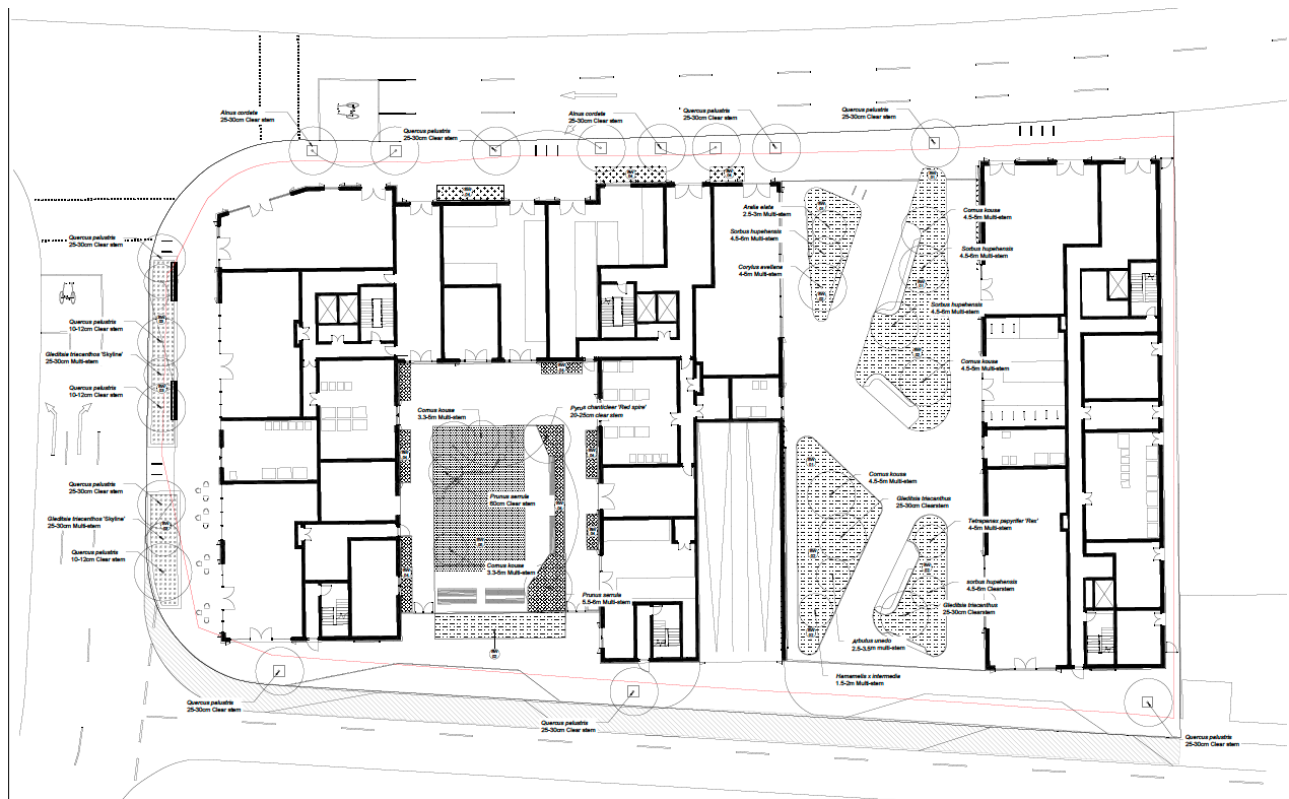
The softworks planting plan - v.2 dated 29/06/2022
